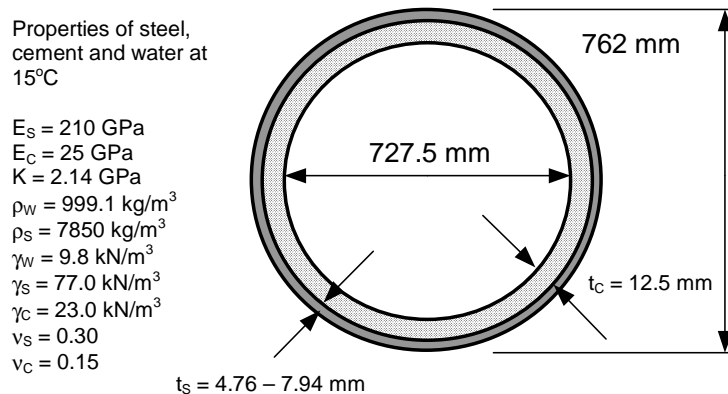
Cross section and details for the Morgan Transmission Pipeline
